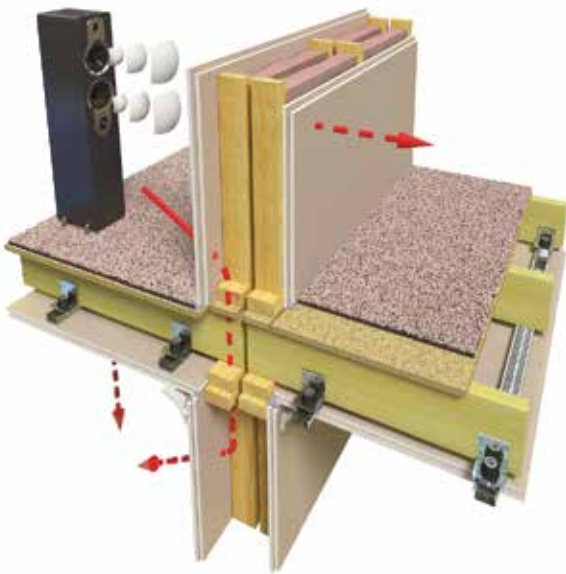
Flanking and Airborne Noise Pathways Through Floor/Wall Junction
